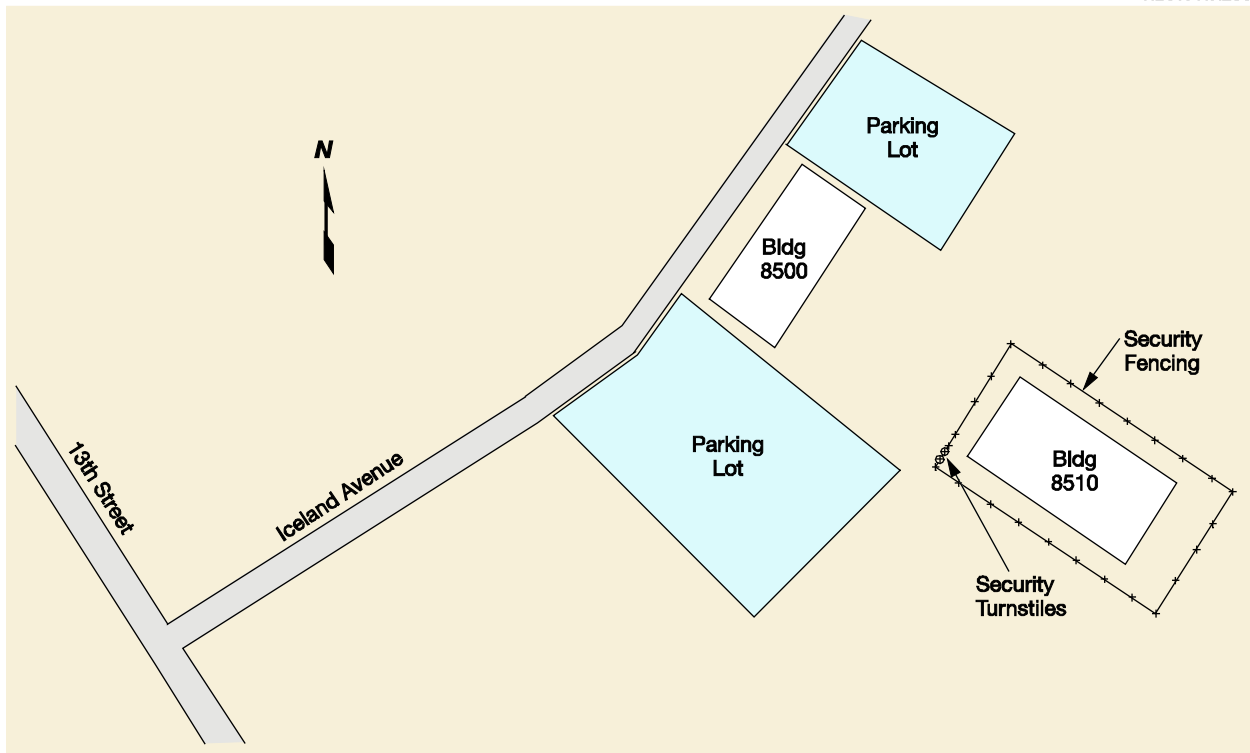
Remote Launch Control Center (Building 8510) Site Plan
